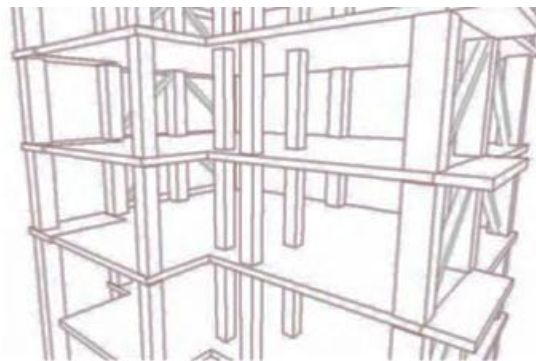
A general view of the reinforced concrete frame systems with flat slab (mushroom slabs) (Birgönül et al., 2012)
